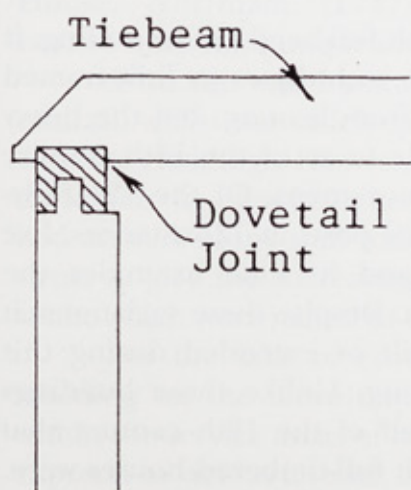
Assembly and Wallplate level, Lower Standard Hill, Ninfield (1702).
